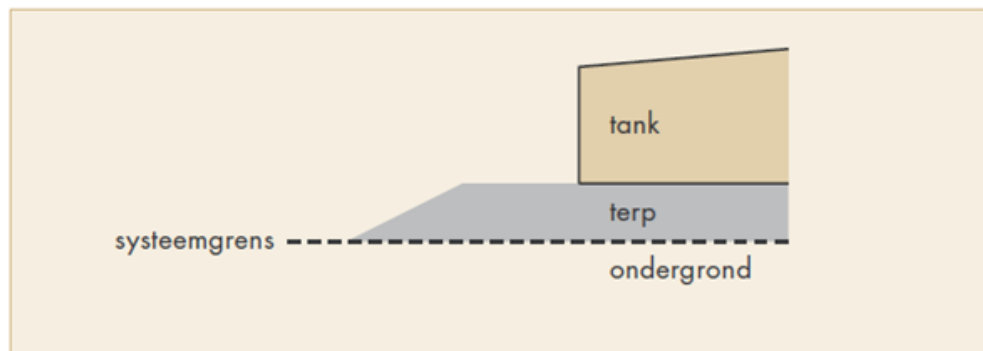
Schematic diagram of sealing structure under an above-ground storage tank.
